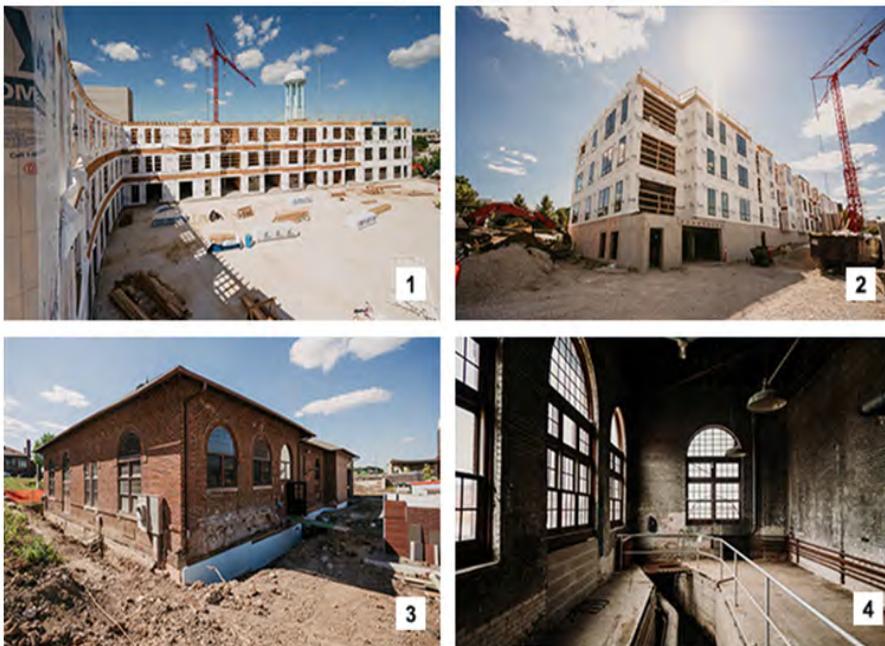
Exterior view looking Northeast where the private resident courtyard is located (2) Exterior view looking Southwest at the below-grade parking entrance (3) Exterior view of the historic powerhouse building and associated foundation wall repair (4) Interior view of the historic powerhouse building and existing conditions
